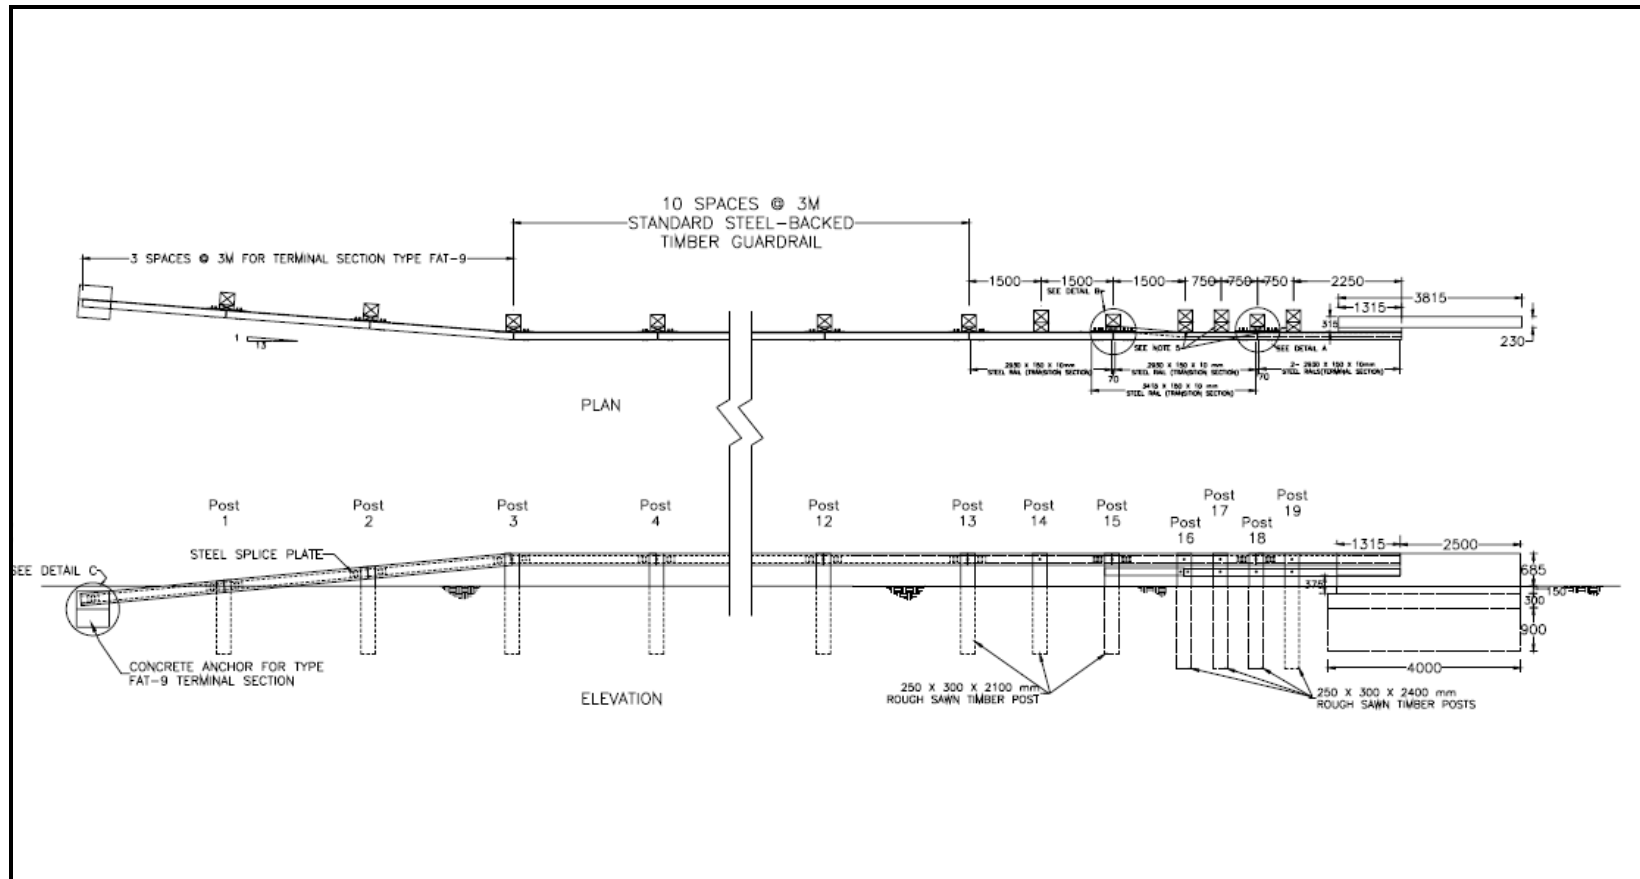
Layout of Type A Steel-Backed Timber Guardrail
